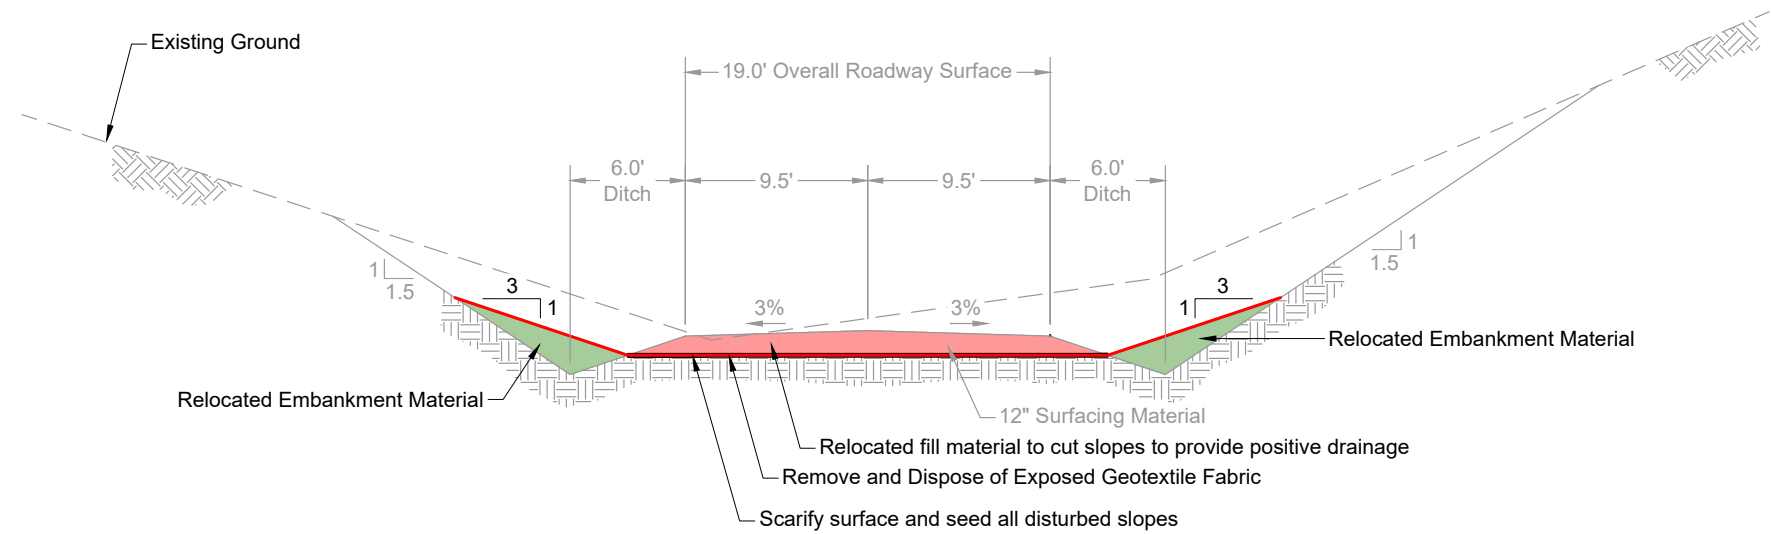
illustrates proposed reclamation details for the access road while Figure 8 illustrates the proposed details for bridge and culvert reclamation.
